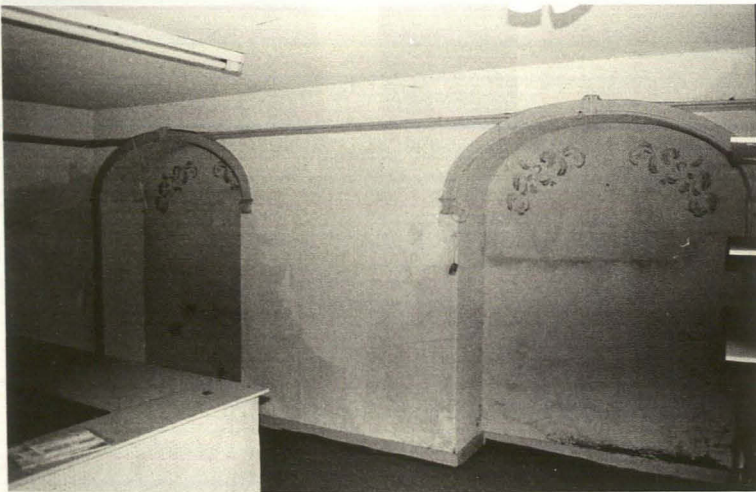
Detailed Interior View of West End Shop, showing arched alcoves and shop counter, looking southwest
